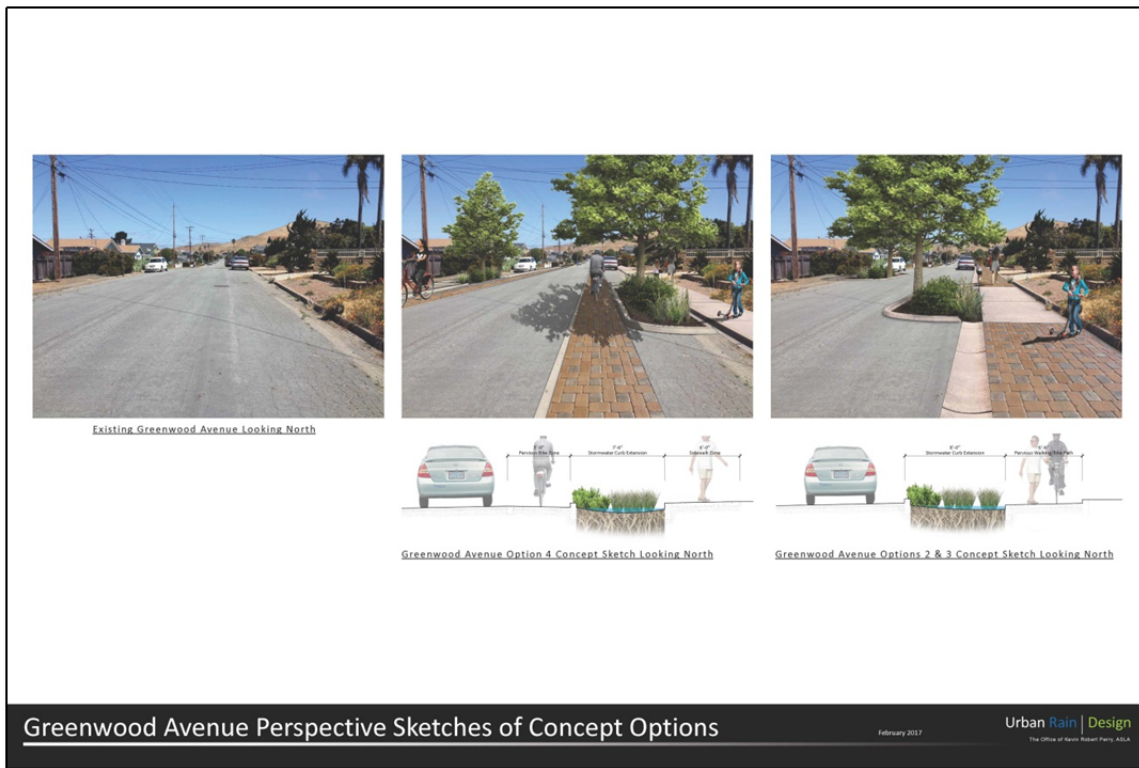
Greenwood Avenue (Sequoia Street to Elena Street)
